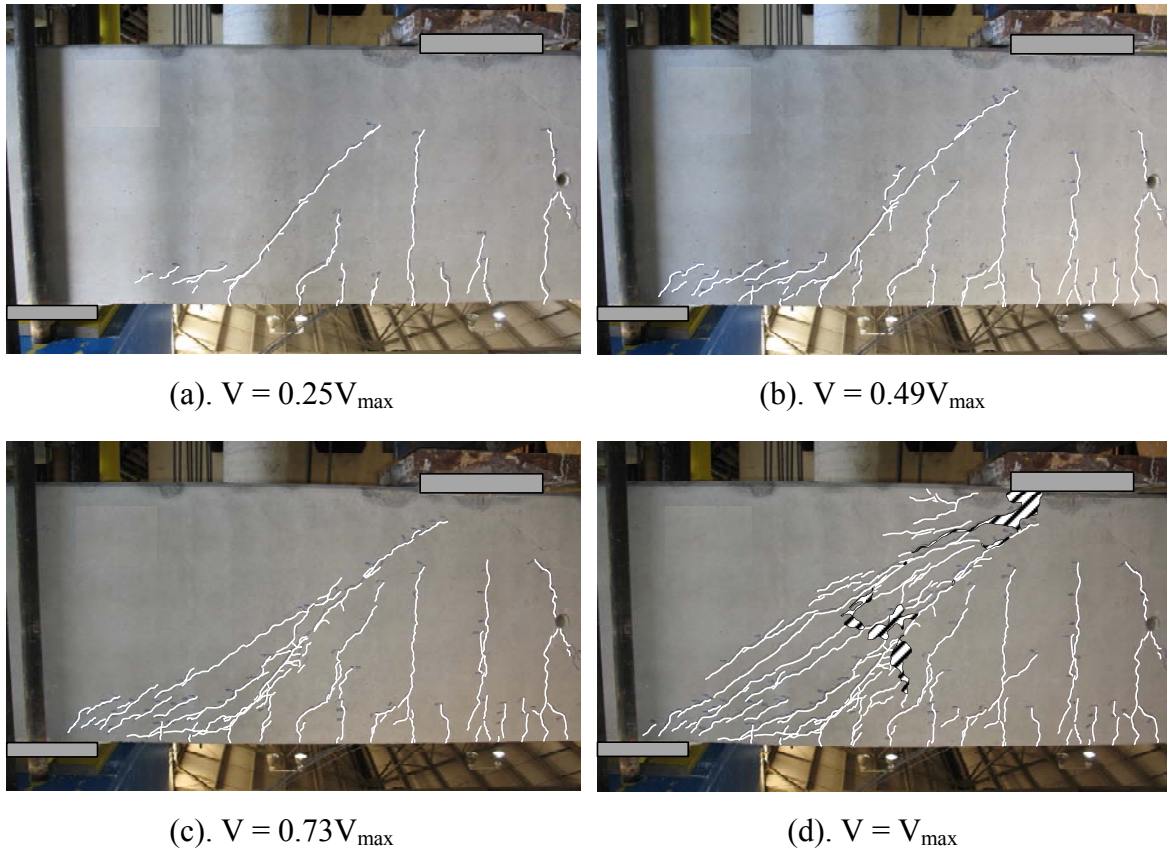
Crack development in specimen without web reinforcement, III-1.85-0
